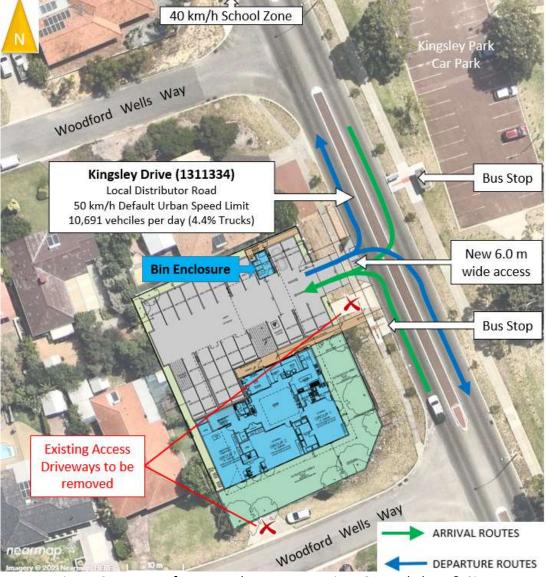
Extract from Development Drawing: Ground Floor & Site
